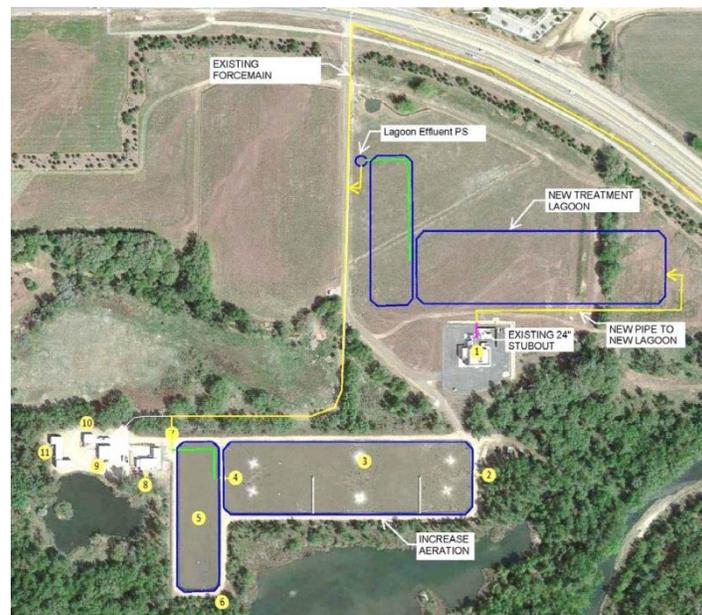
Wastewater Treatment Plant proposed improvements<sup>5</sup>
